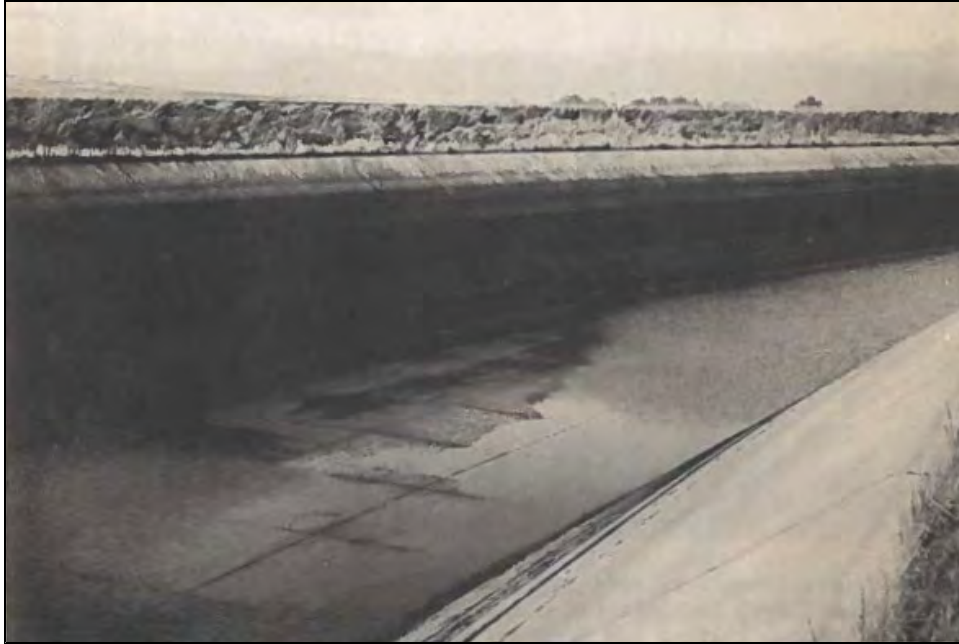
M.P. 11.15, concrete lining and heaving of bottom slab.⁶⁸
